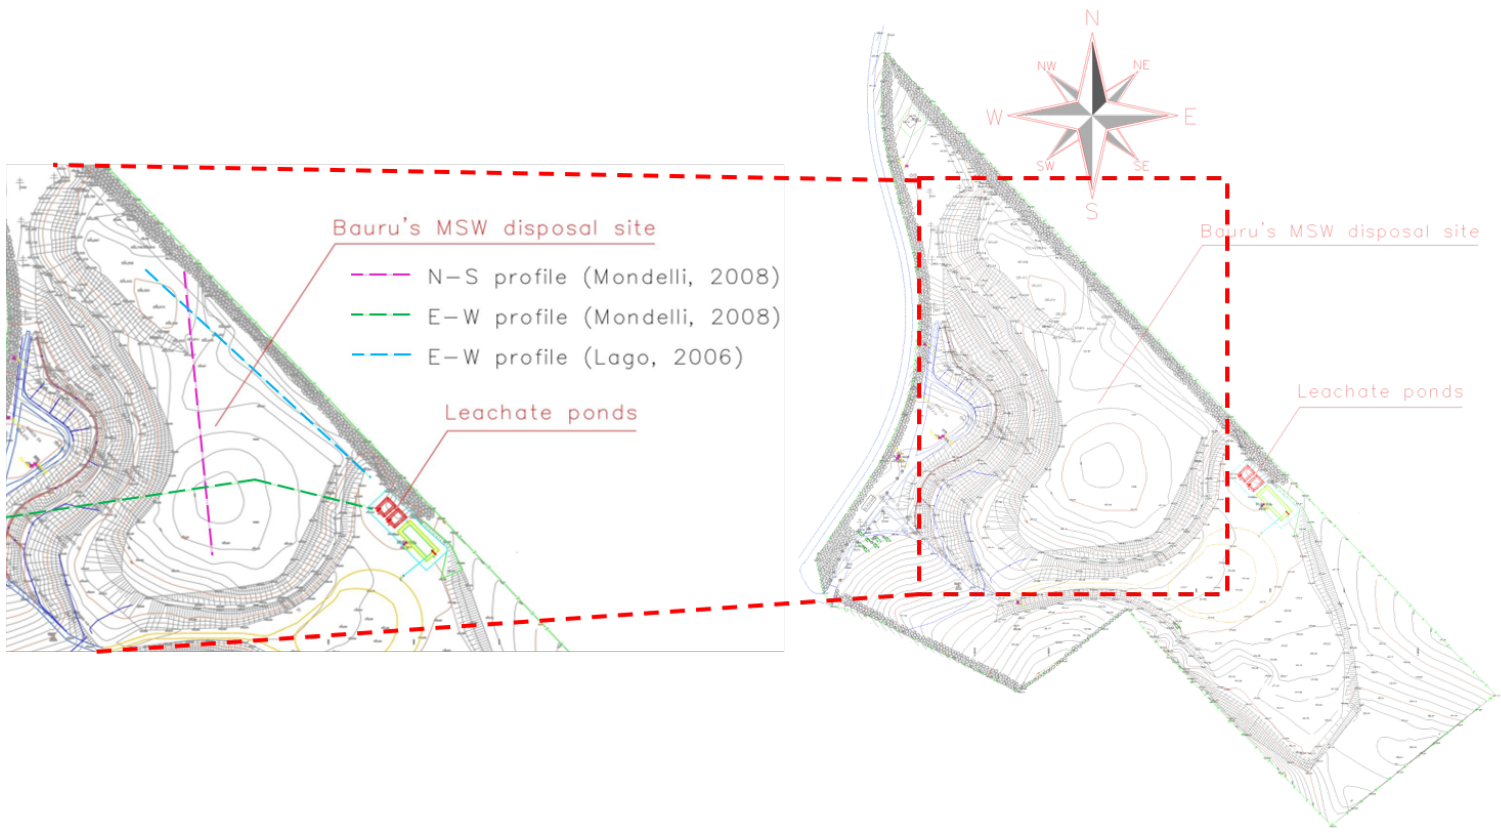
Analyzed sections of Bauru's MSW disposal site.
